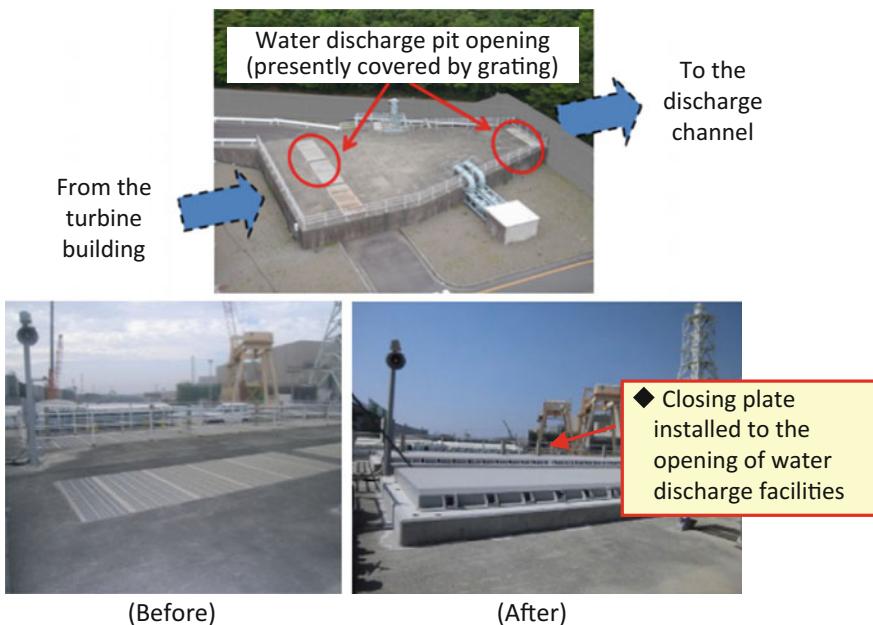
Example of a closing plate installed at the opening of water discharge facilities [2]
